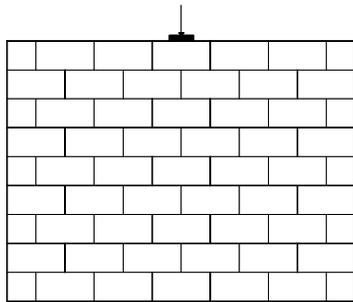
Plain hollow concrete masonry wall (load over central web)
